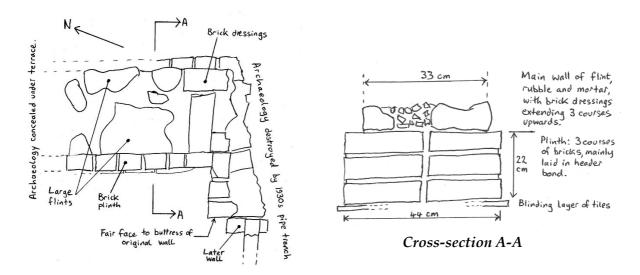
Sketch plan and elevation of the excavated wall - See Figs. 7 and 8
